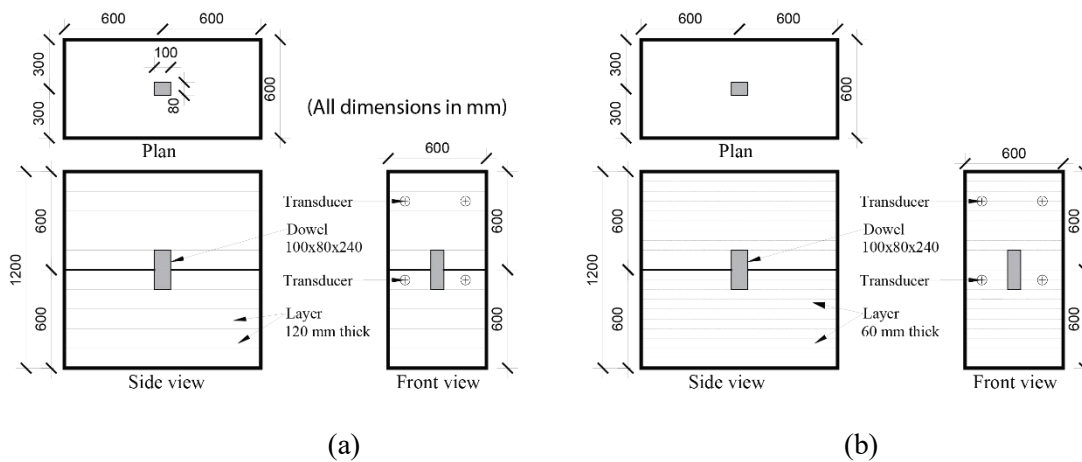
Test specimen details and measuring points: (a) R-120-S; (b) R-60-S.
